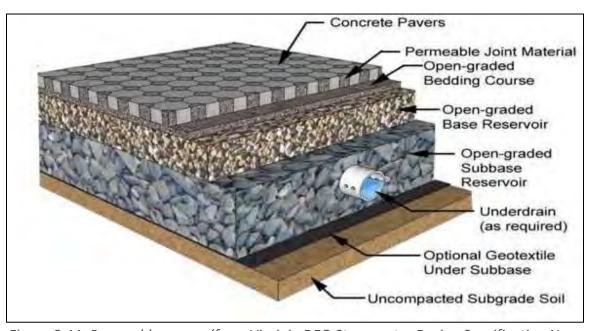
Permeable pavers (from Virginia DEQ Stormwater Design Specification No. 7).
